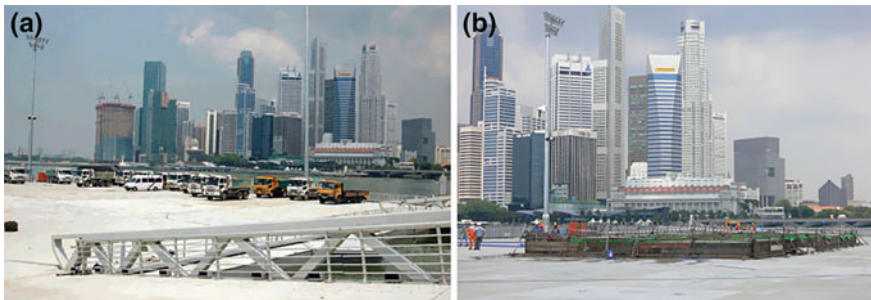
Load testing of the floating platform a extreme vehicle load test b water containment load test
